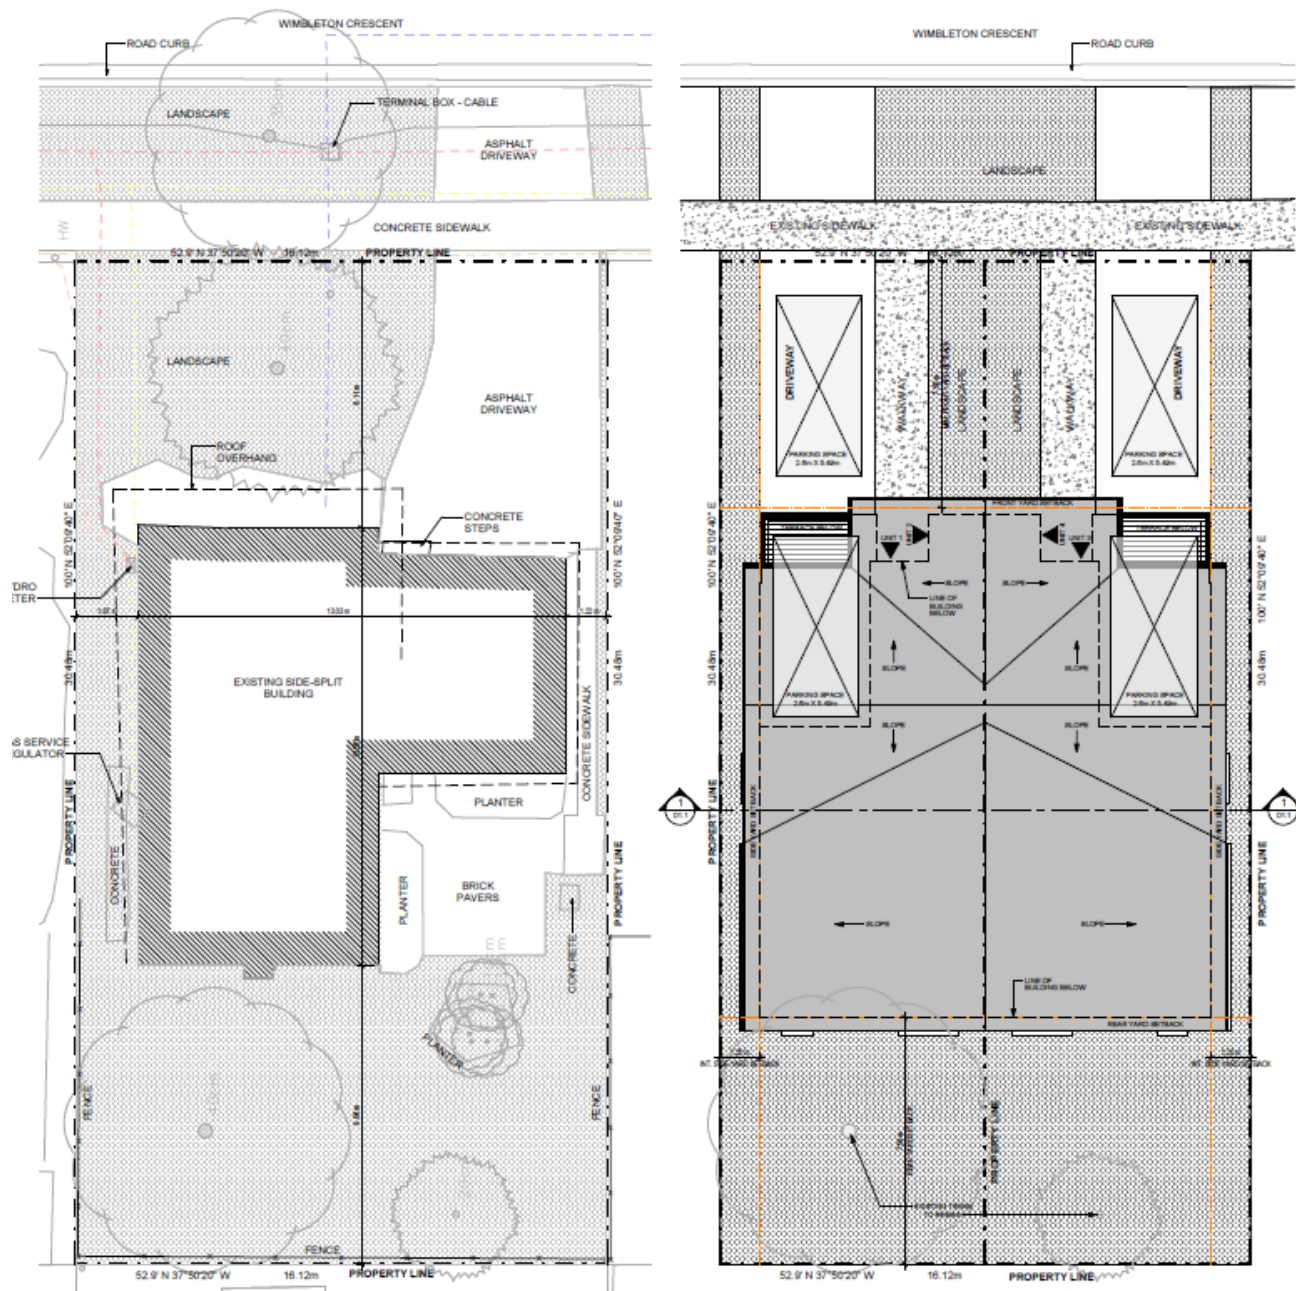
Existing Conditions (Left) And Site Plan (Right)
